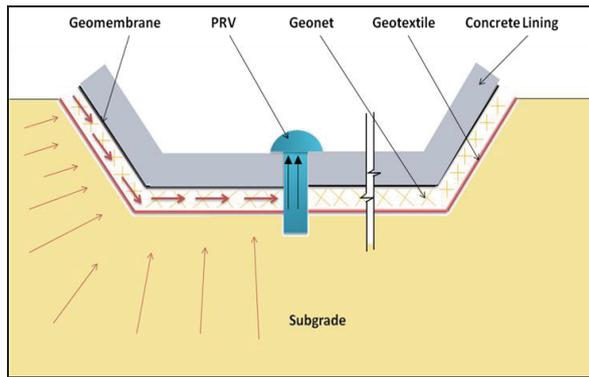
Schematic arrangement of canal lining with drainage arrangements
